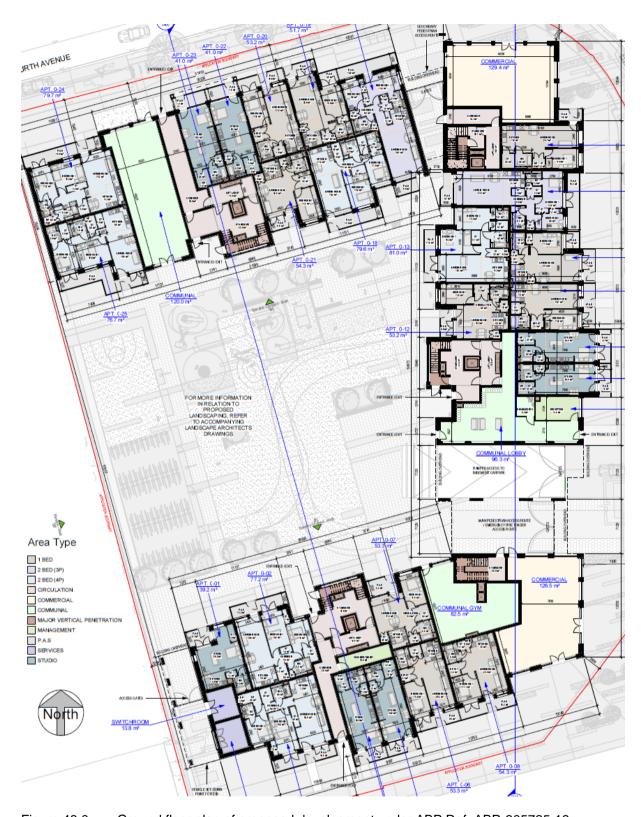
Ground floor plan of proposed development under ABP Ref. ABP-305725-19
